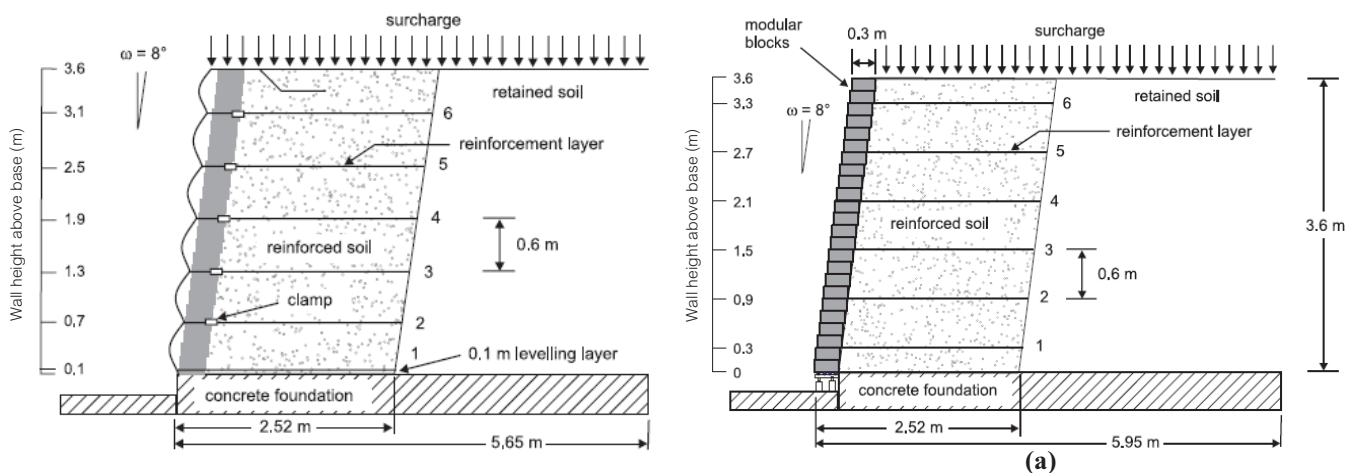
Cross-section of the GRS test wall: (a) flexible wrapped face wall; (b) stiff segmental face wall (Bathurst et al. 2006)
